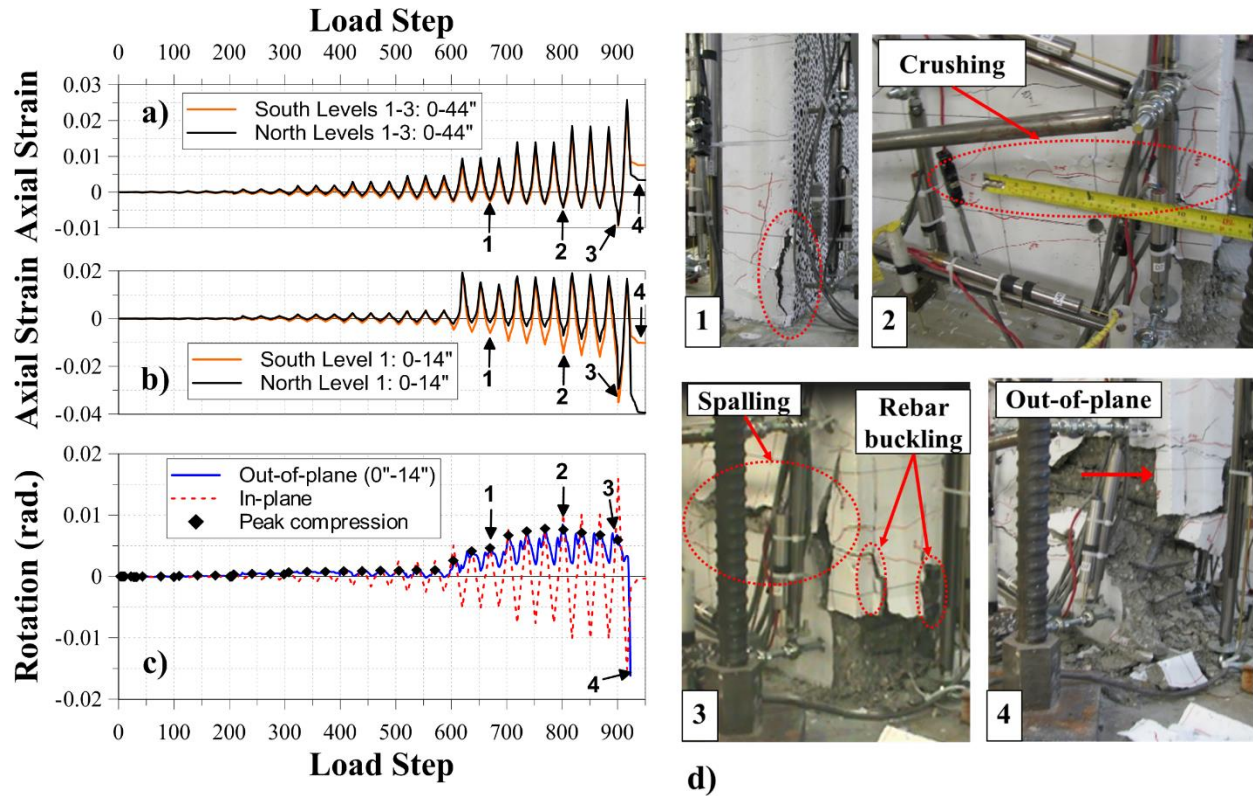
Out-of-plane behavior at west boundary of specimen WP1 – a) Average axial strain over Levels 1-3 (0-44 in.); b) Axial strain in Level 1 (0-14 in.); c) Out-of-plane rotation in Level 1; and d) Damage states: (1) Vertical cracking and spalling on southwest corner (+0.5% rotation), (2) Minor cover crushing on north face (+1% rotation), (3) Cover spalling and rebar buckling (+1.5% rotation, cycle 1), and (4) Out-of-plane instability
